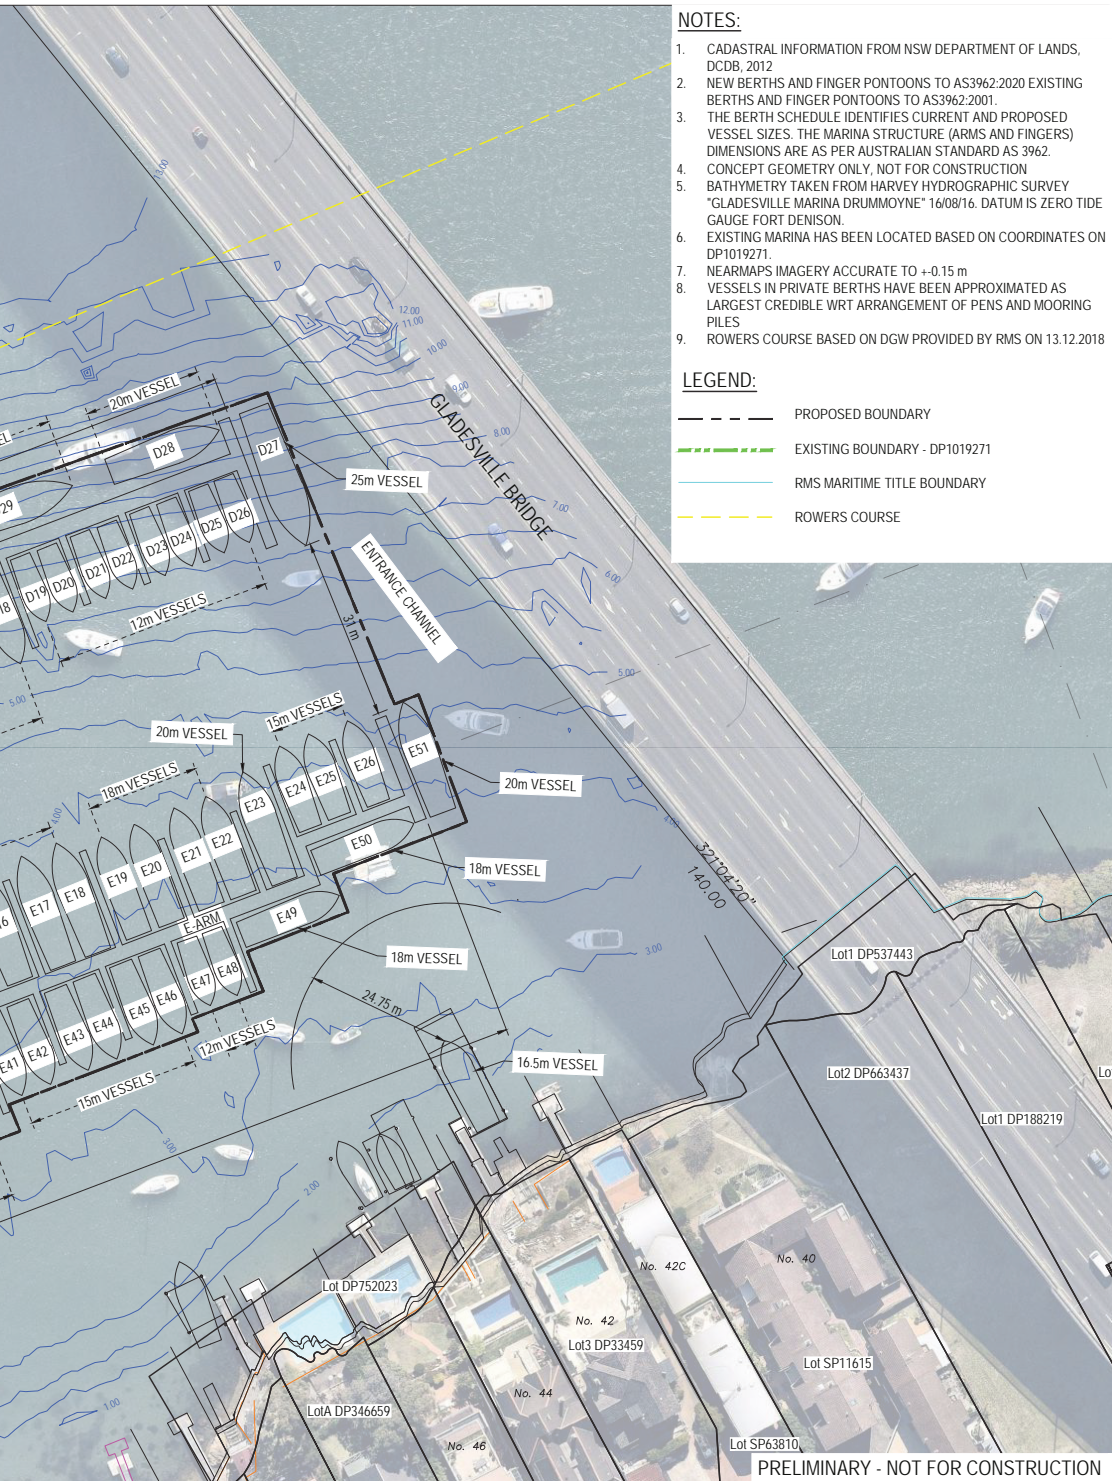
Proposed Marina Extension Layout Drawing Revision H Overlaying wider context Aerial image (source GHD)
